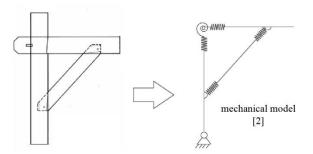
Mechanical model proposed in [2] and [3] for a braced beam-column connection
